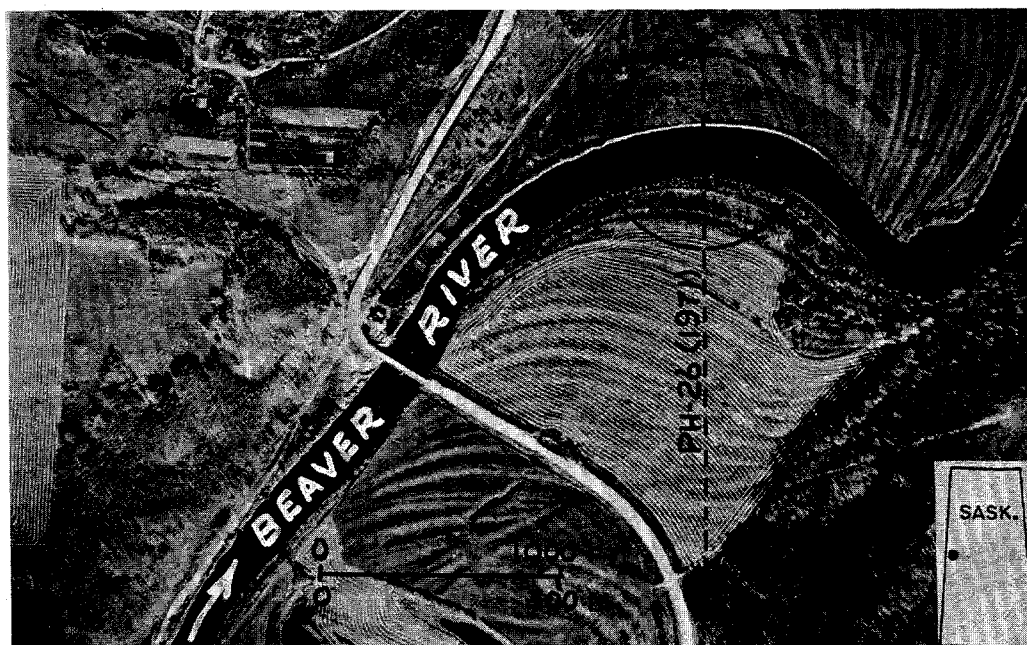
Aerial photograph of Beaver River at PH-26 crossing site, on May 10, 1968. Bridge shown was replaced by new bridge in 1971, at the location circled. (From Saskatchewan Dept. of Highways and Transportation.)
